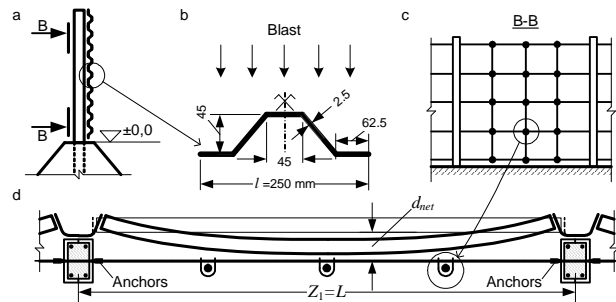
Details of the blast wall: (a) vertical section; (b) profiled steel section; (c) view from the back showing a safety net; (d) plan
